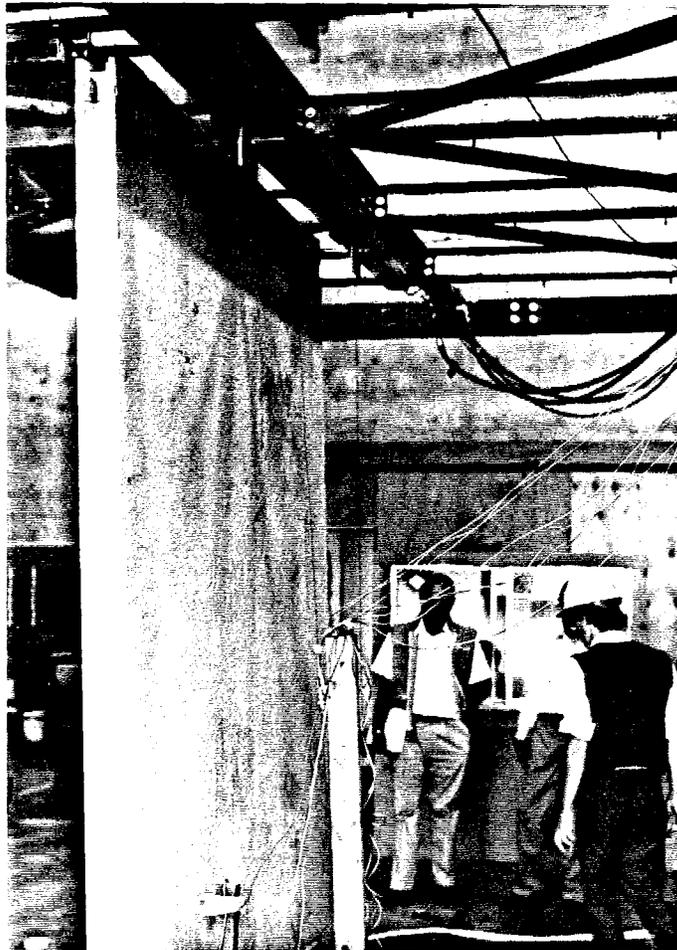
Overall View of Typical Failure of Threaded-Rod Lateral Connections at Top Cyclic Test Specimen FPCRT-L6; Run No. A6
